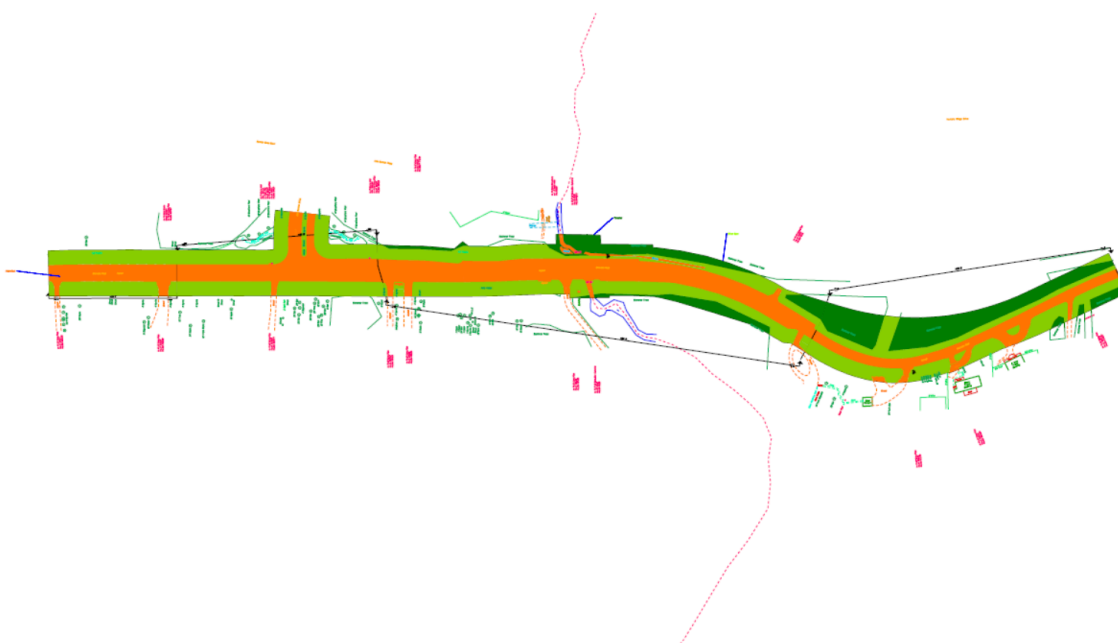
Revised Plan View of Existing Conditions Land Types of Entire Project Area
